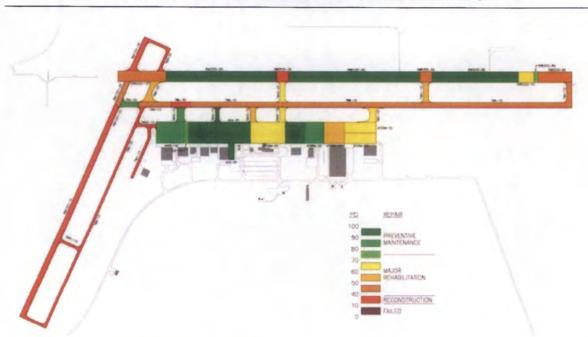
COLUMBIA EXISTING PAVEMENT PCI (2008 INSPECTION)
